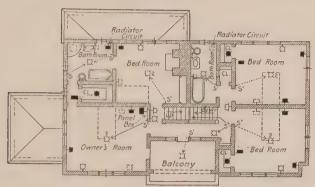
Typical wiring plan for second floor of residence. This is the second story of the building shown in Fig. 128.
